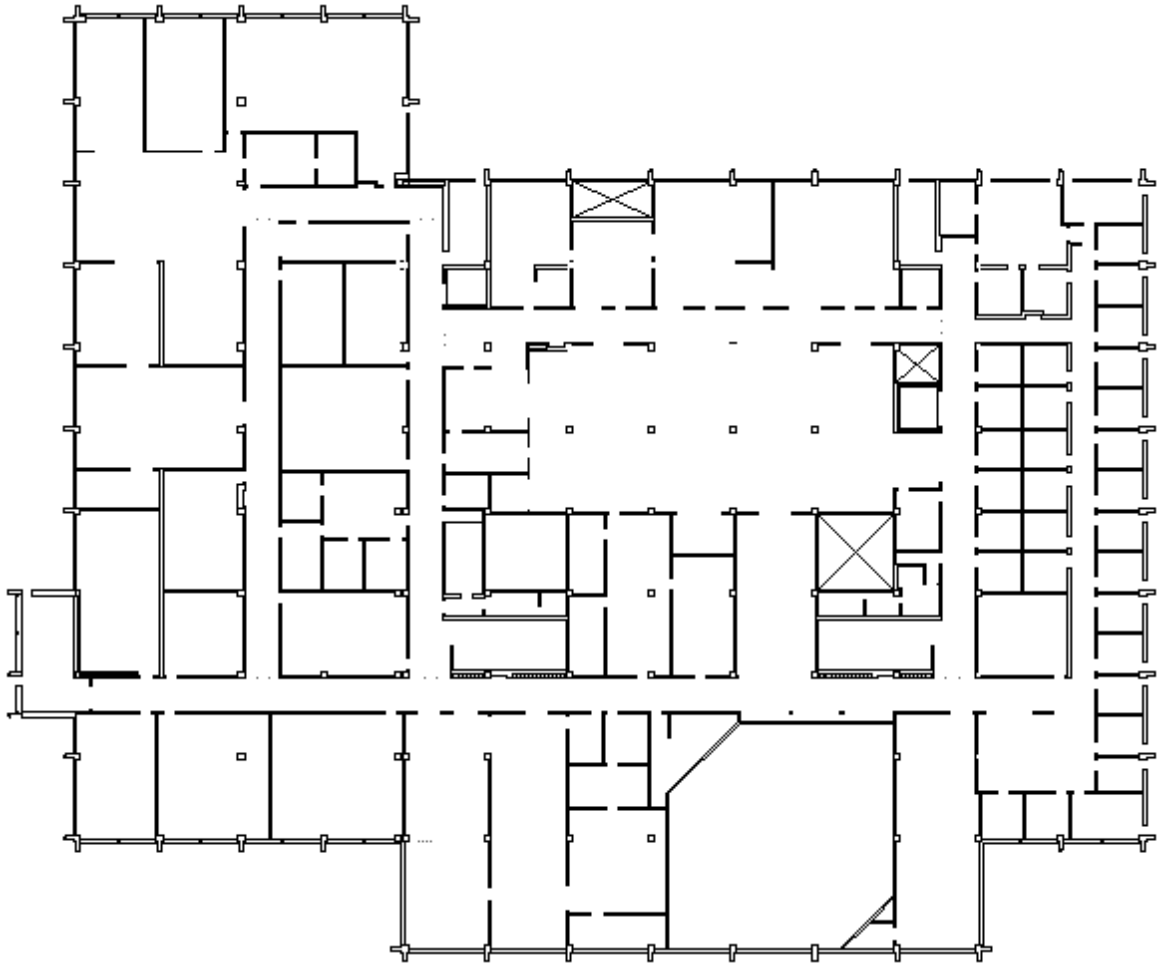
Original CAD drawing of Clyde Building 4th floor.
